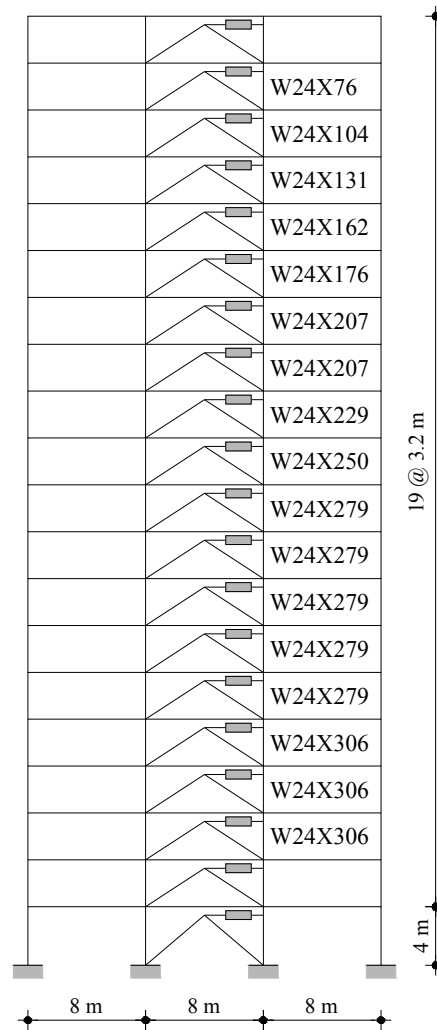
Elevation view and design details of the 20-storey steel MRF with dampers designed for SF equal to 3.5. Beams and columns are the same with those of the MRF with dampers designed for SF=1 apart from the indicated interior columns
